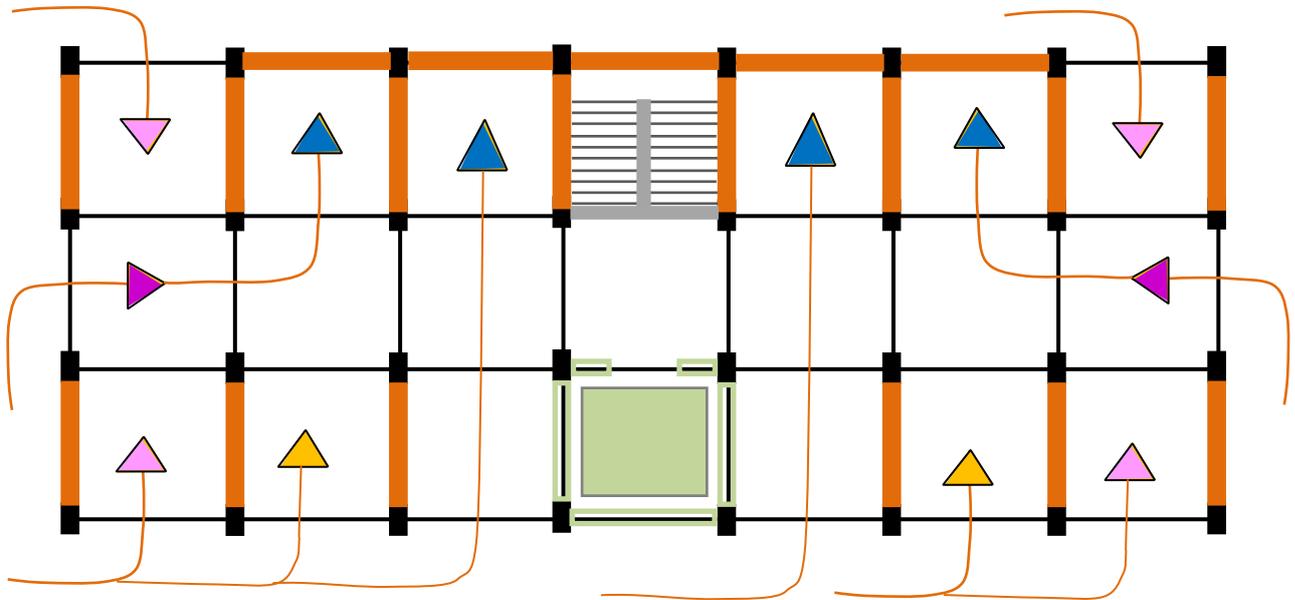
Retrofitting scheme of open ground storey; triangle indicates parking (Murty,2006)
